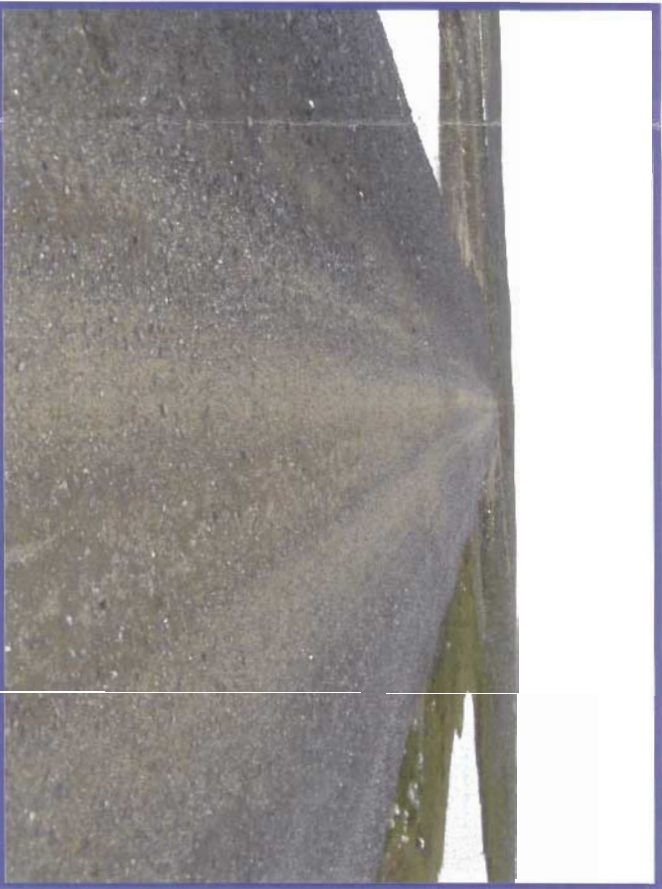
shows a view looking towards the south abutment. The crest appears to be smooth and flat with no signs of cracking or settlement.
